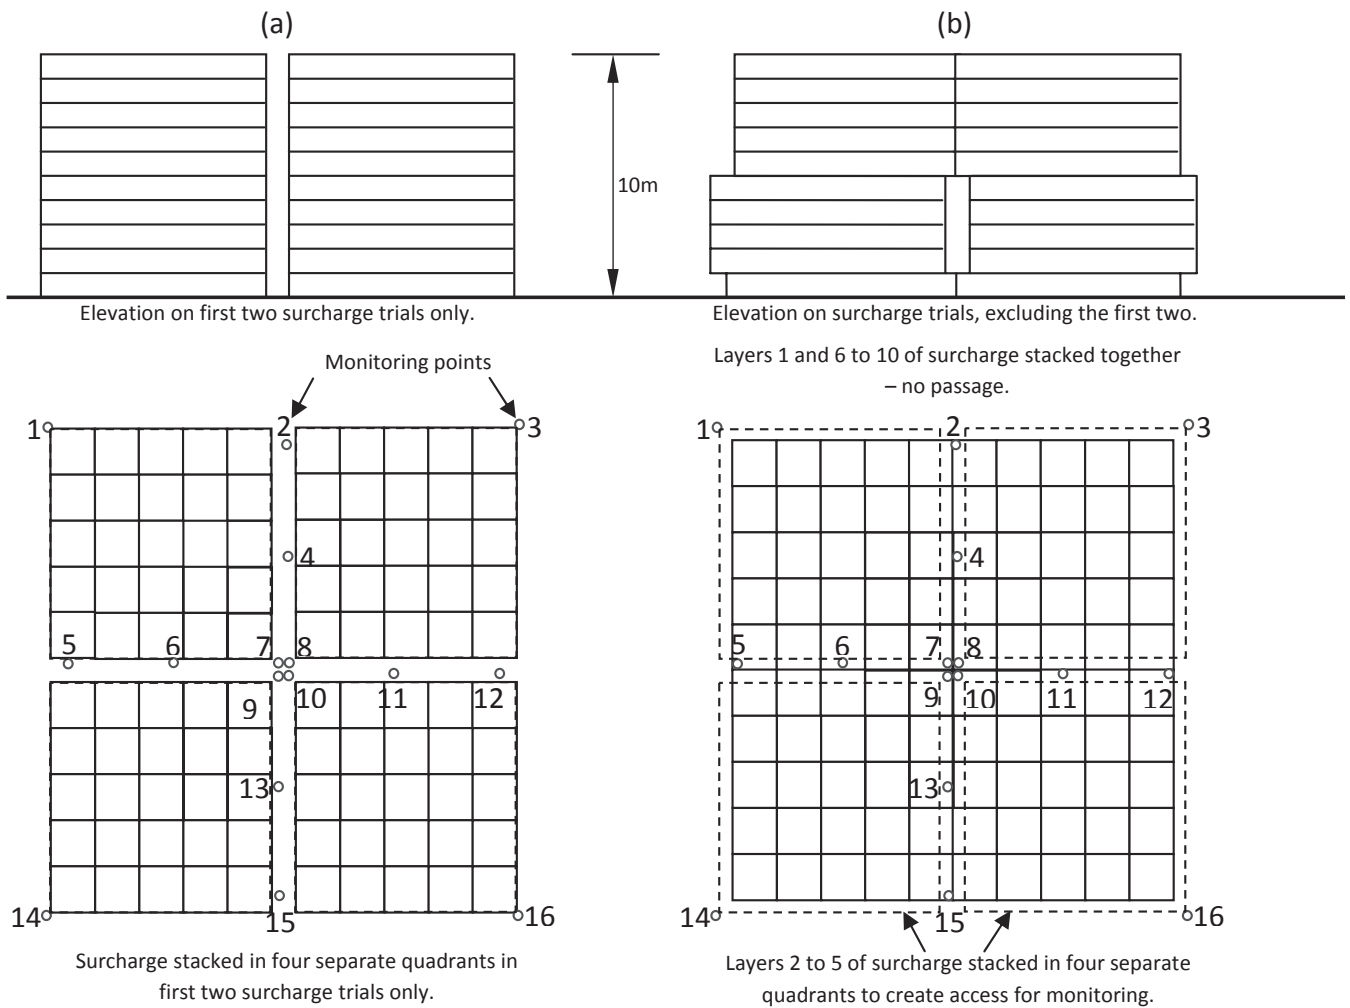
Elevation and plan views of the two surcharge trial arrangements used.
